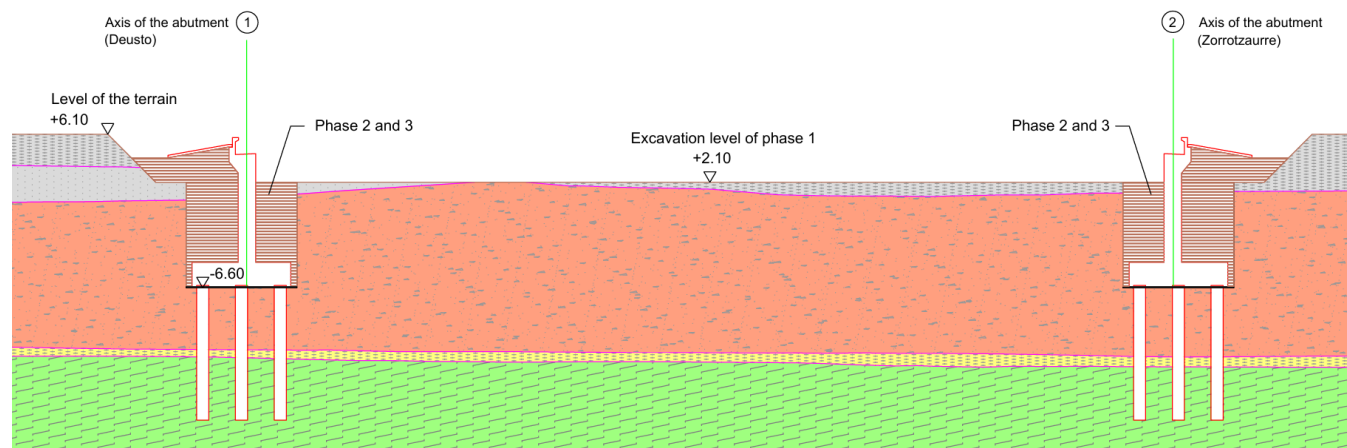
Finished construction of foundations and abutments [Own elaboration]
